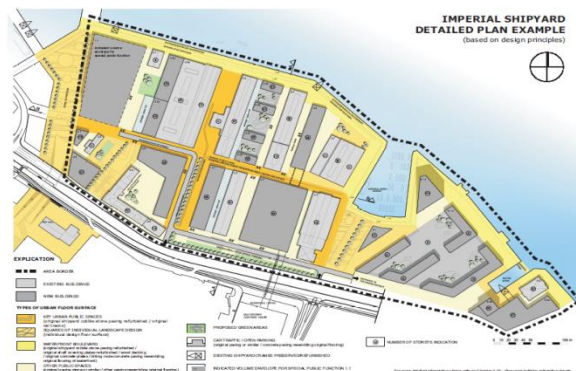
Detailed plan for Imperial Shipyard. Source: Author's own archive
